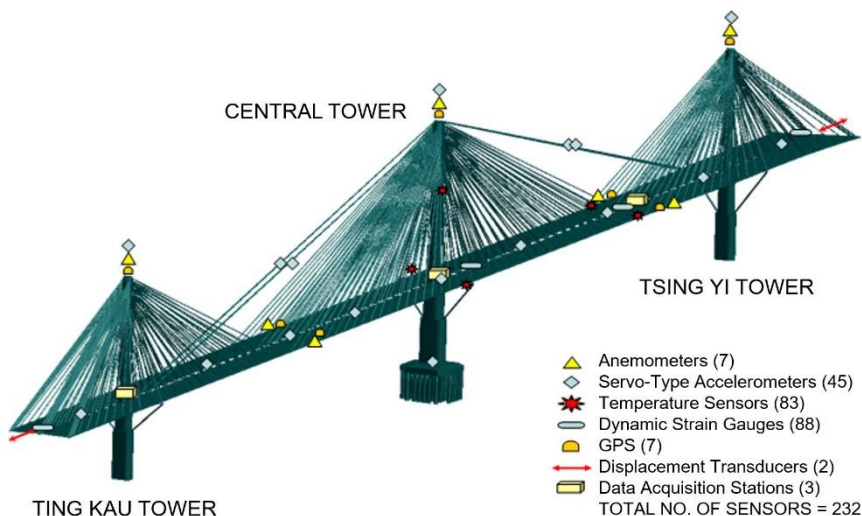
Location of GPS rover receivers on the Ting Kau Bridge
